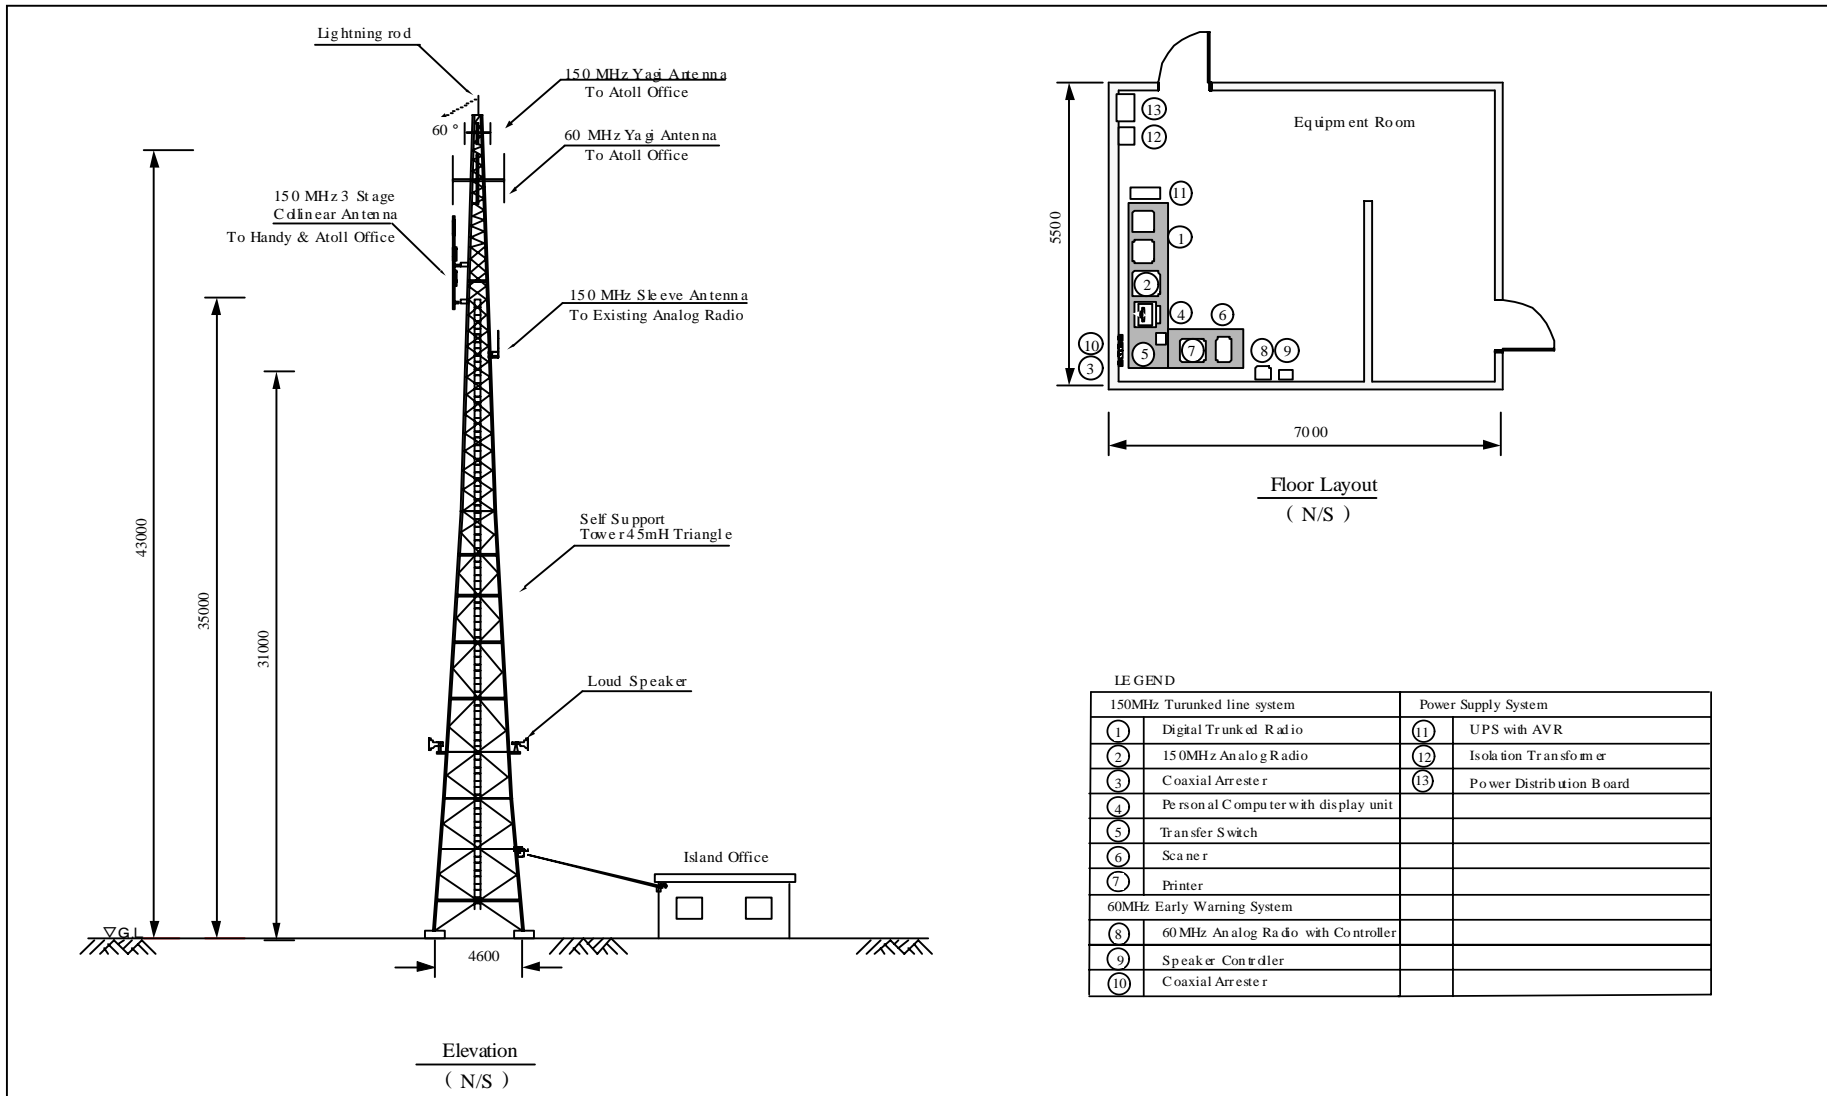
6 E Example of Typical Facility Layout (Island Office)
